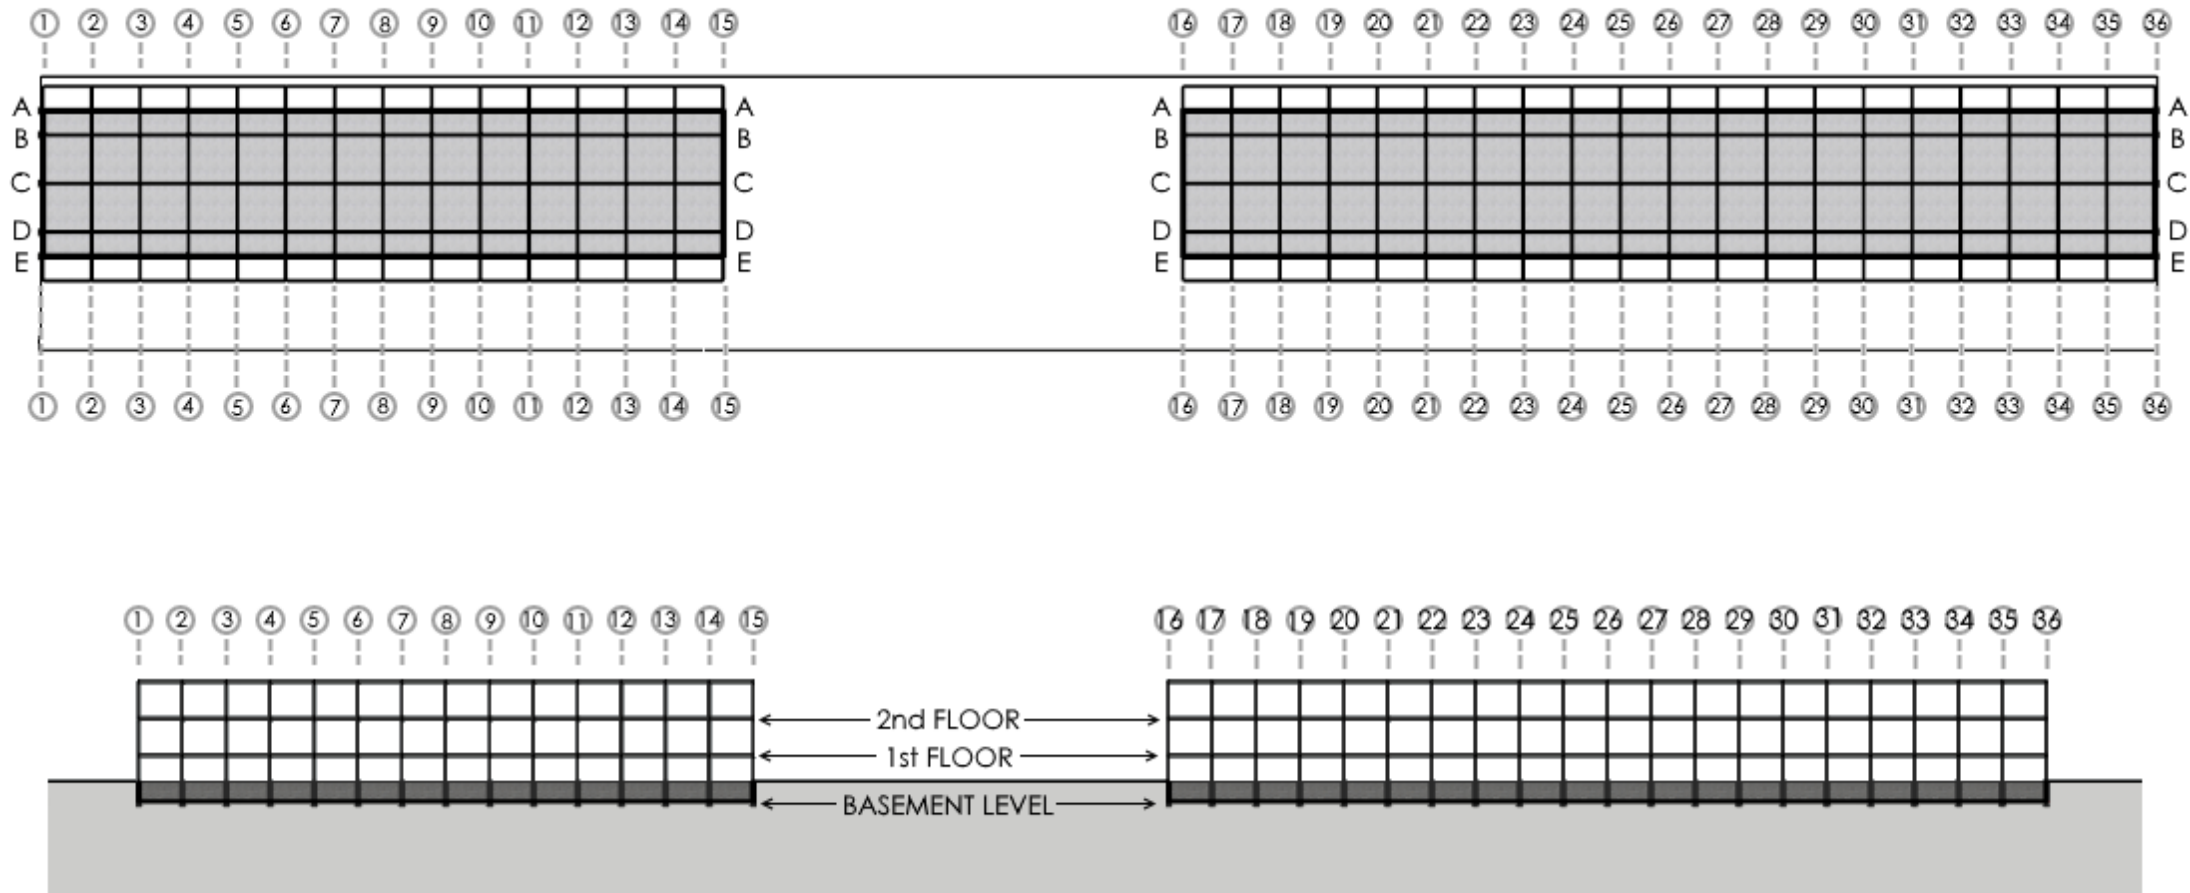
Structural diagram illustrating the basis of the structural system developed for the proposed project.
